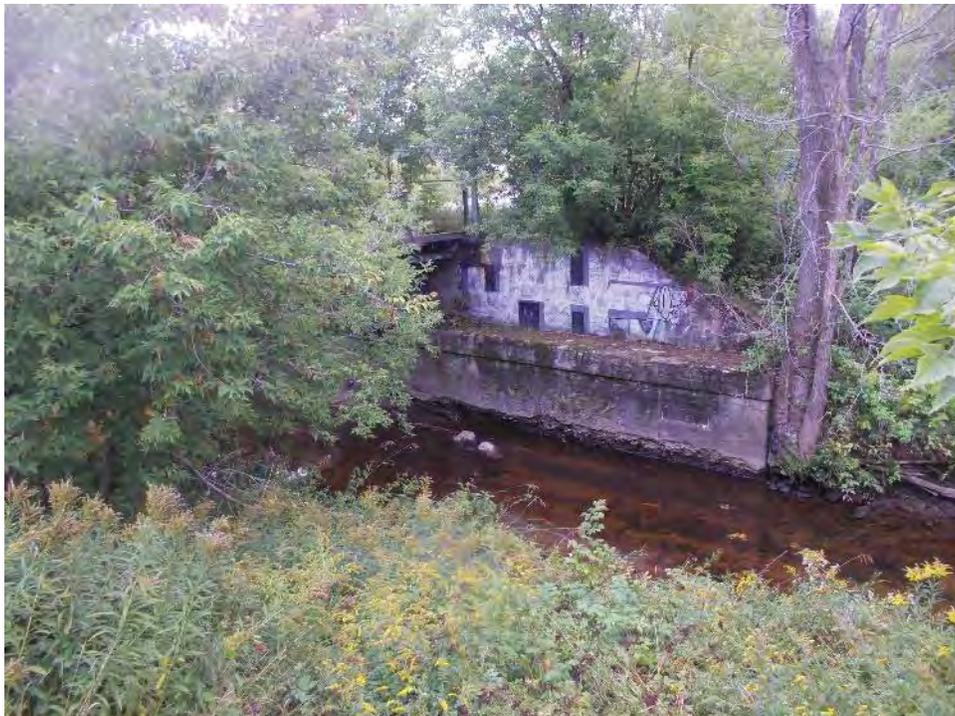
Railway Bridge Abutment, South Bank. Facing Southeast.
